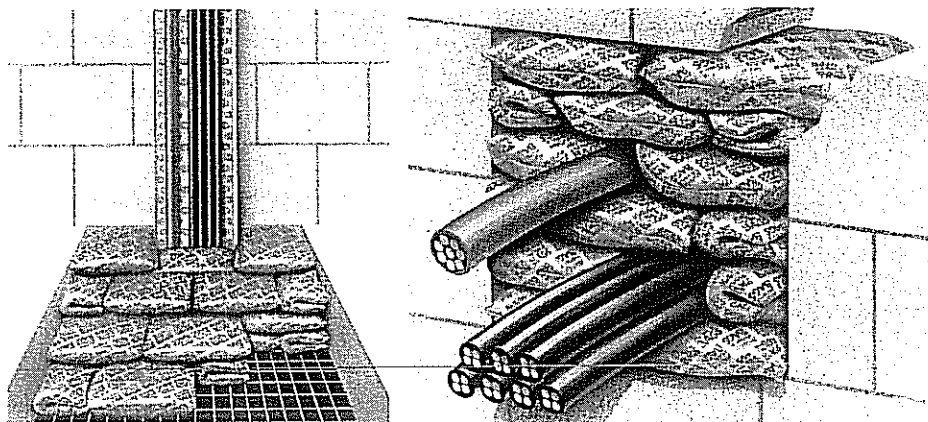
& 5.8 - Nullifire System B fire stop bags shown sealing vertical and horizontal openings.
